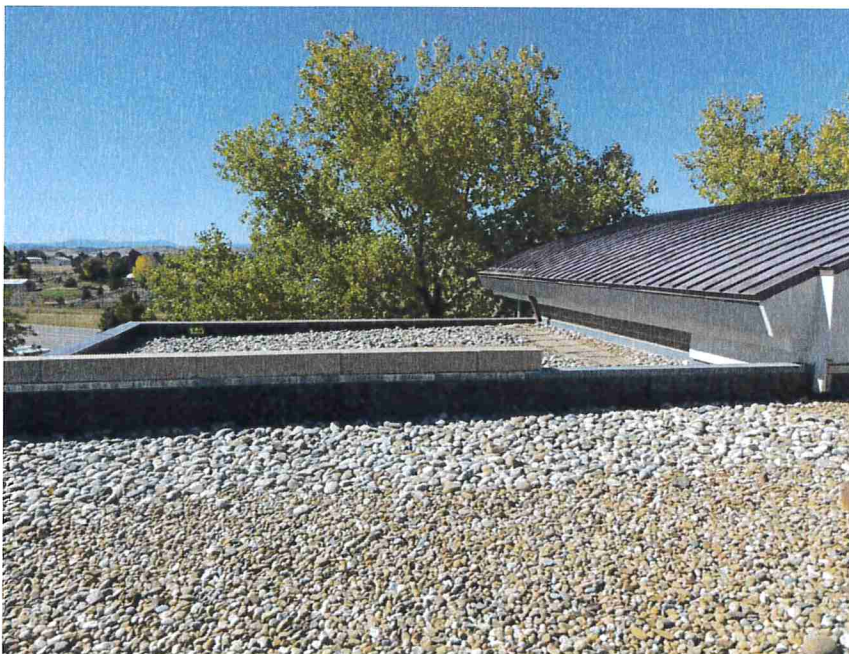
View of the southwest roof area with a ballasted EPDM system and the standing seam metal roof located north of the ballasted EPDM.
